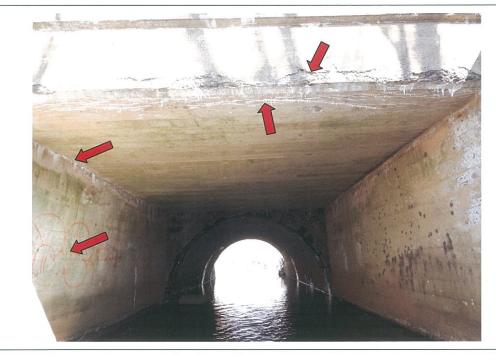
General view of underside of the reinforced concrete deck slab, looking north. Note spalled/ delaminated concrete and fine cracks with efflorescence at the south fascia and underside of the concrete slab. Note also, moderate to heavy efflorescence between slab/ west abutment interface and graffiti at the west abutment breastwall.
